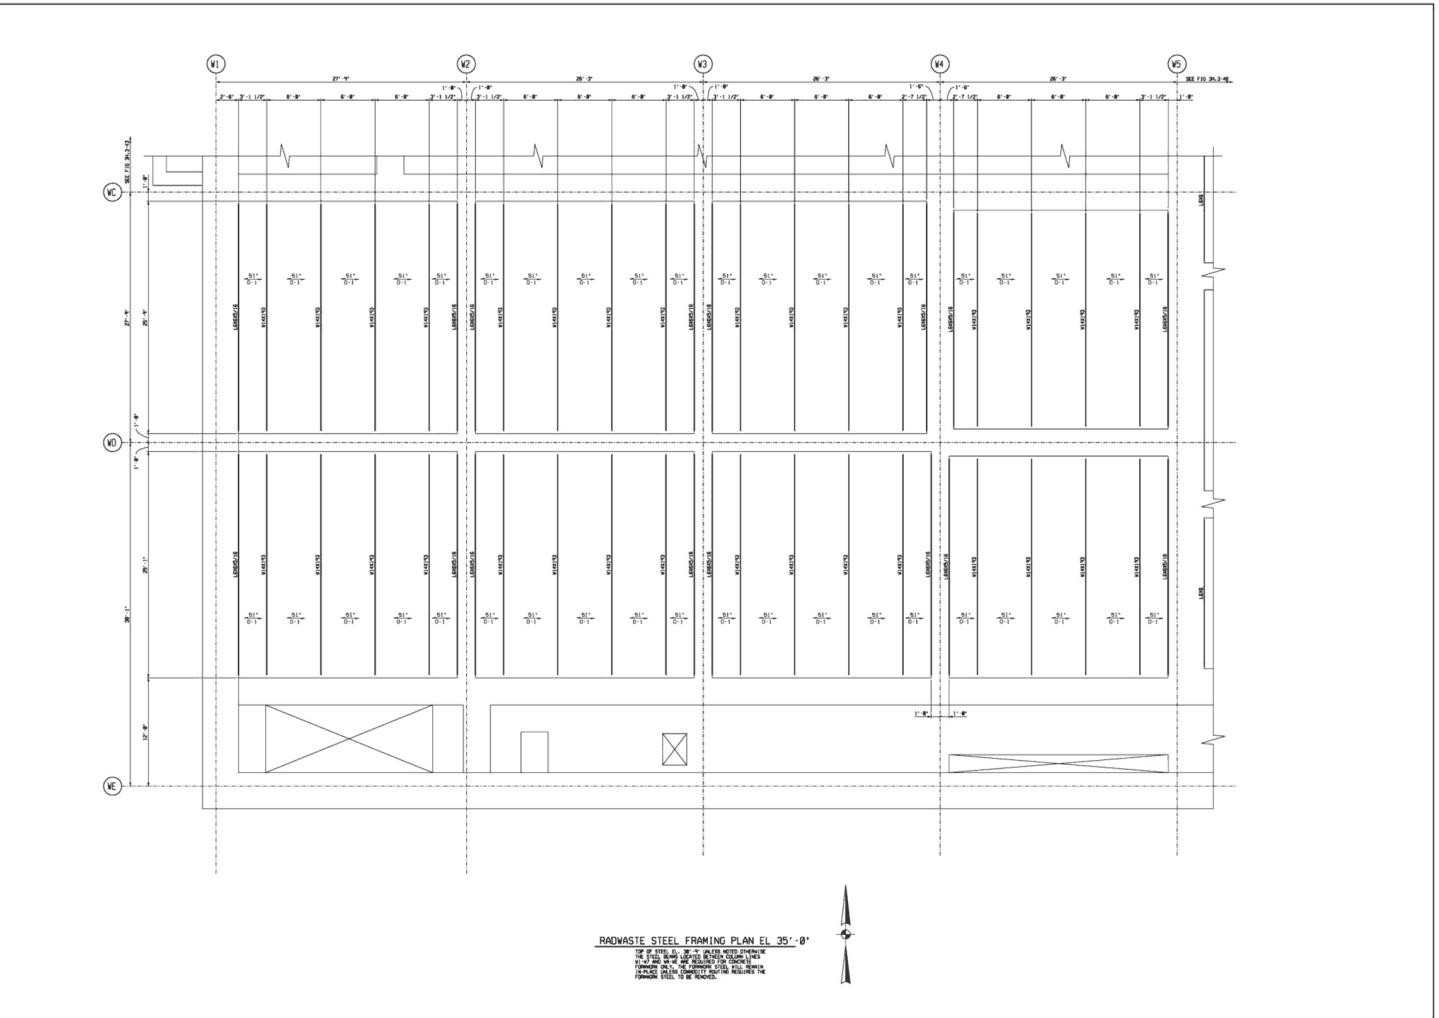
H.3-45 El 35'-0" Steel Layout Between Column Lines W1-W5 and WC-WE
